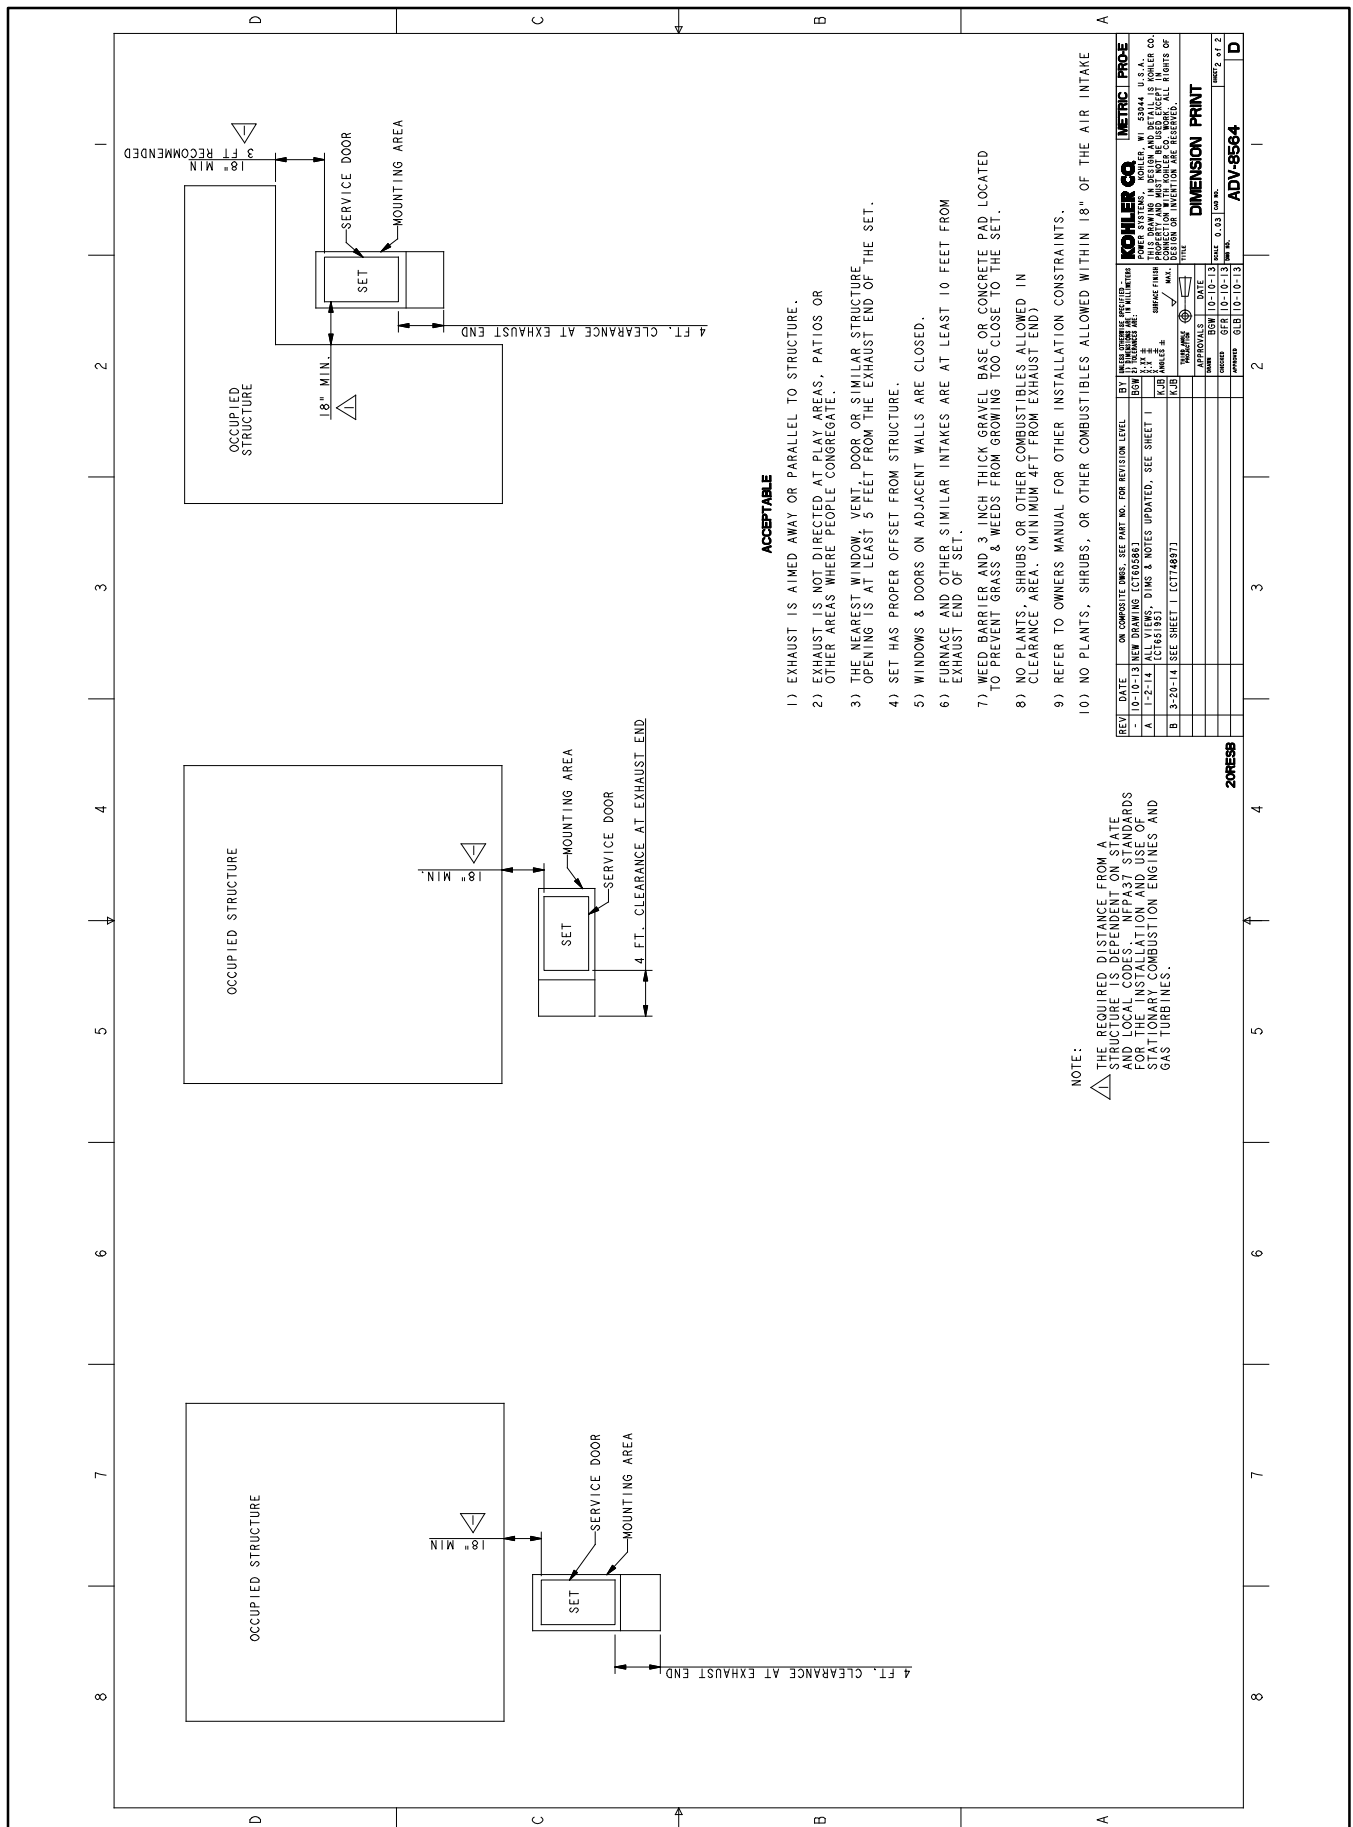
Dimension Drawing (Minimum Clearance from Structure), ADV-8564 Sheet 2
